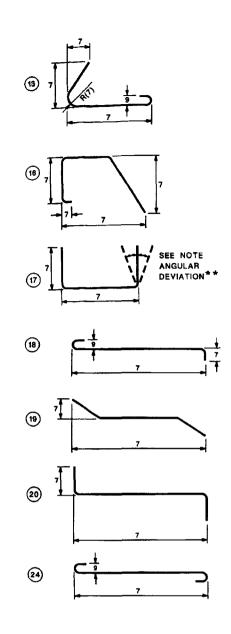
(cont.)-Standard fabricating tolerances for bar sizes No. 3 through 11 (No. 10 through 36).
